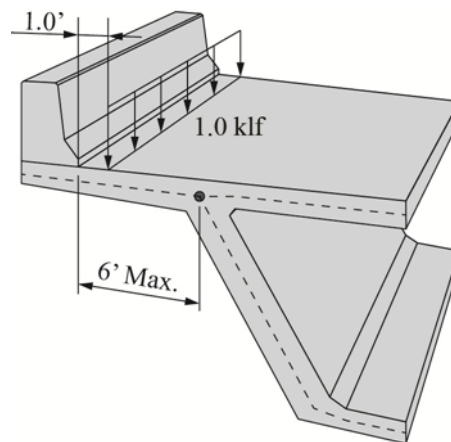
Alternate Vertical Loading for Overhang Design
